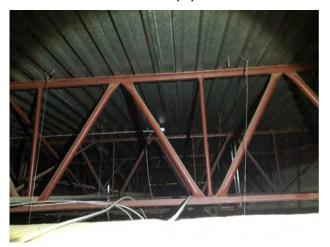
Viewing OWSJ Above Ceiling Space Above Bowling Lanes
